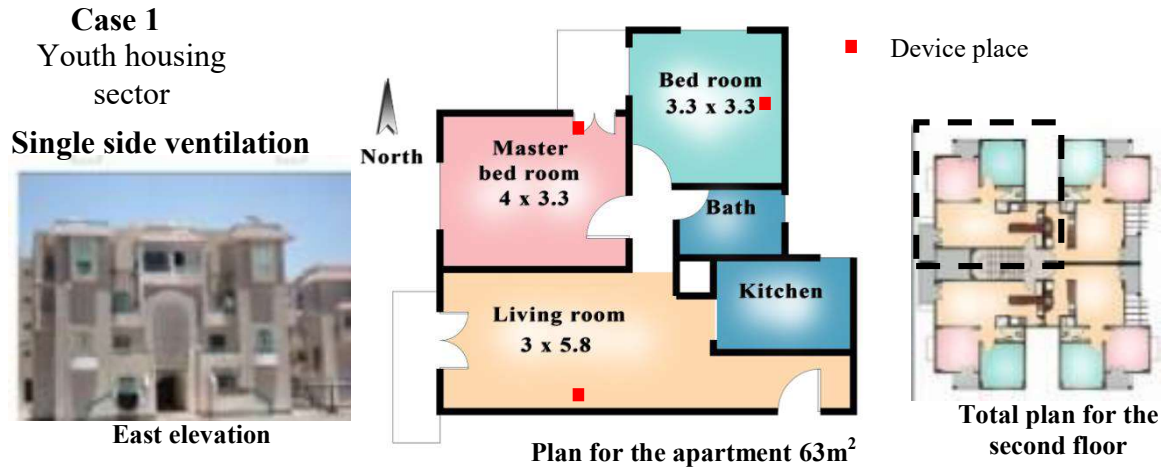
The plan and the floor of the building and the detailed plan of case1 [22, Author].
